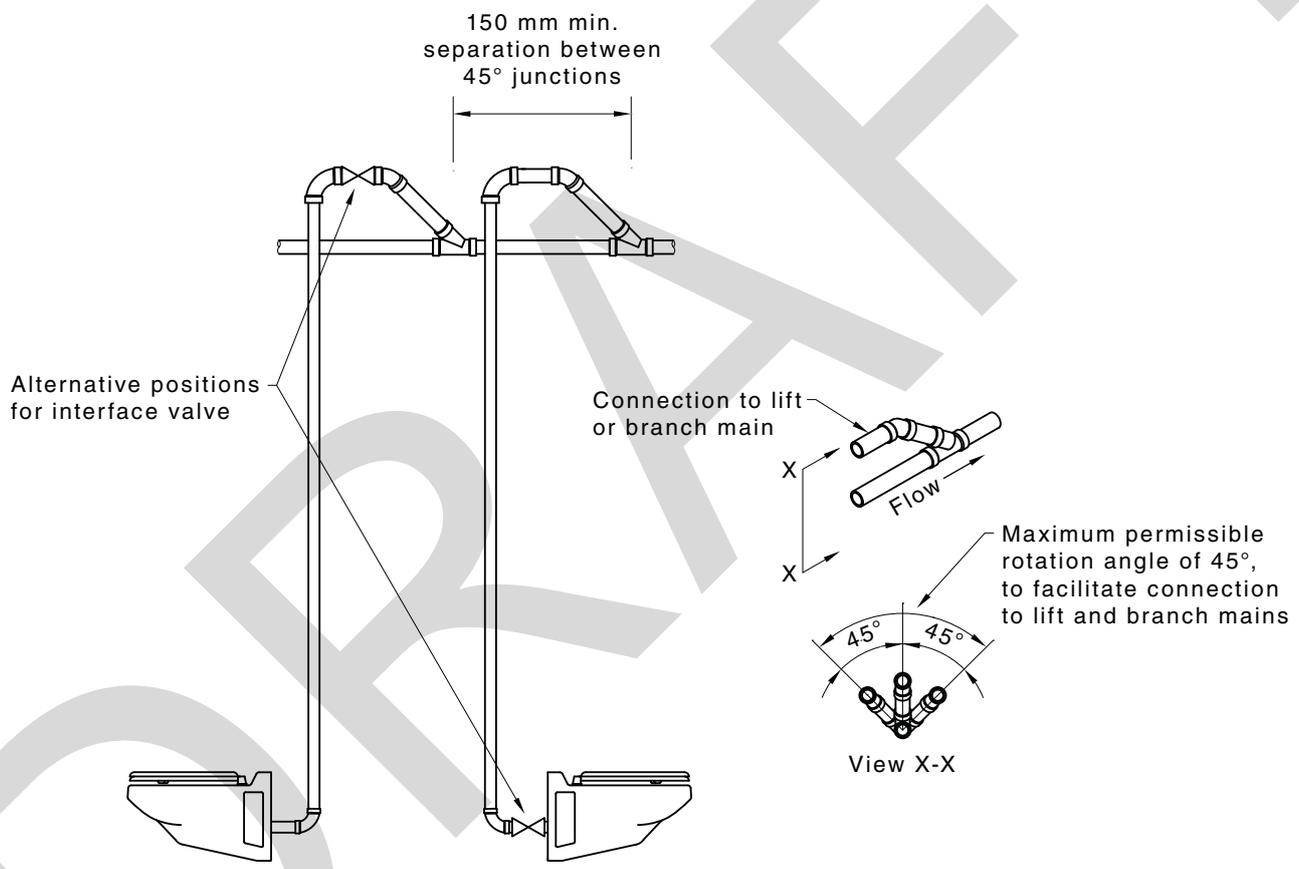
EXAMPLE OF VACUUM LIFT PIPES CONNECTING TO HORIZONTAL VACUUM PIPES
